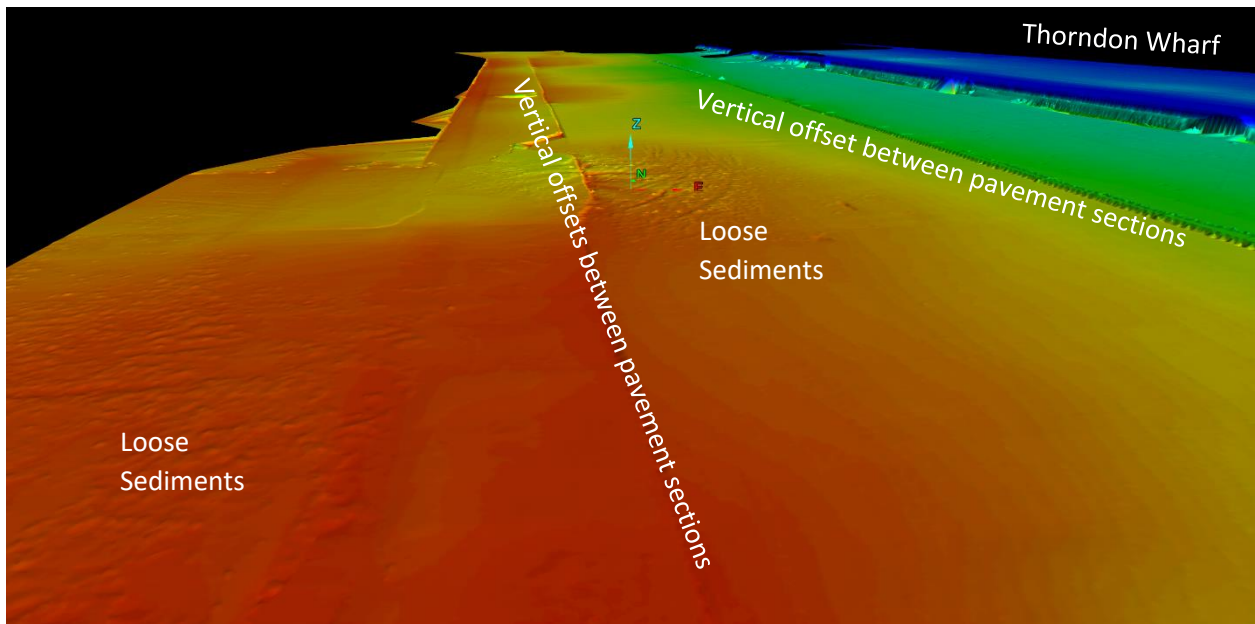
Close-up of the port surface highlighting cracking and separation between asphalt sections as well as loose sediments from ejecta (rougher sections of DEM) in the vicinity of Thorndon Wharf (see Figure 5.39).
